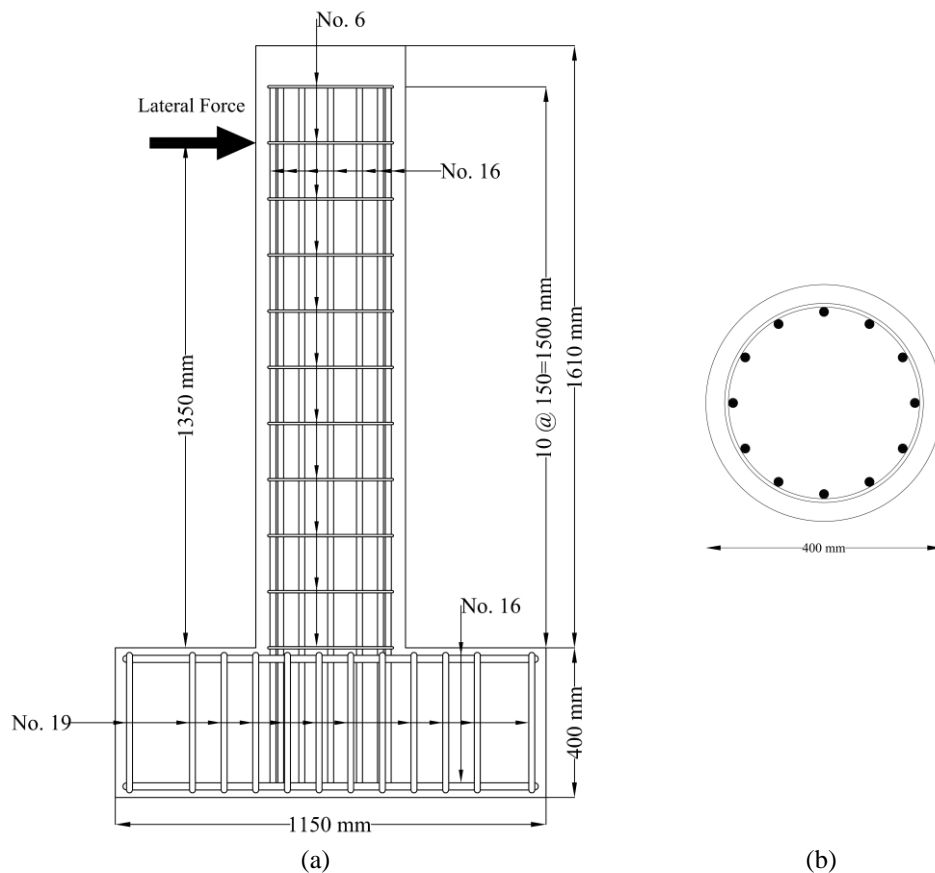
Geometry and reinforcement details of specimen TP-21: (a) elevation, (b) cross section
